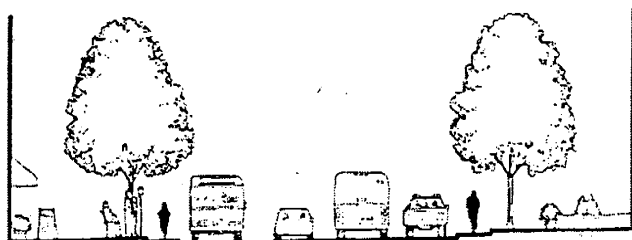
Cross-section of a bike lane between travel lanes and the curb
